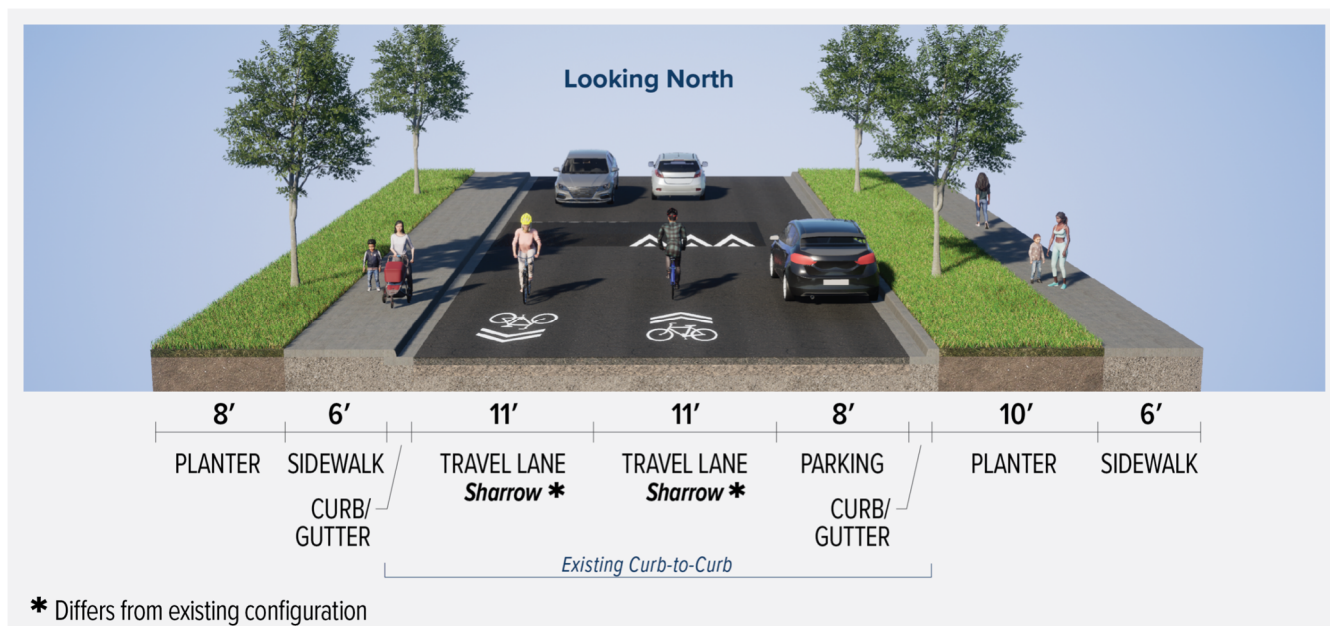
ALTERNATIVE 1 - BETWEEN IRVING AVENUE AND FRANKLIN AVENUE (MAINTAINS EXISTING LANE CONFIGURATION AND CURB LINES)
